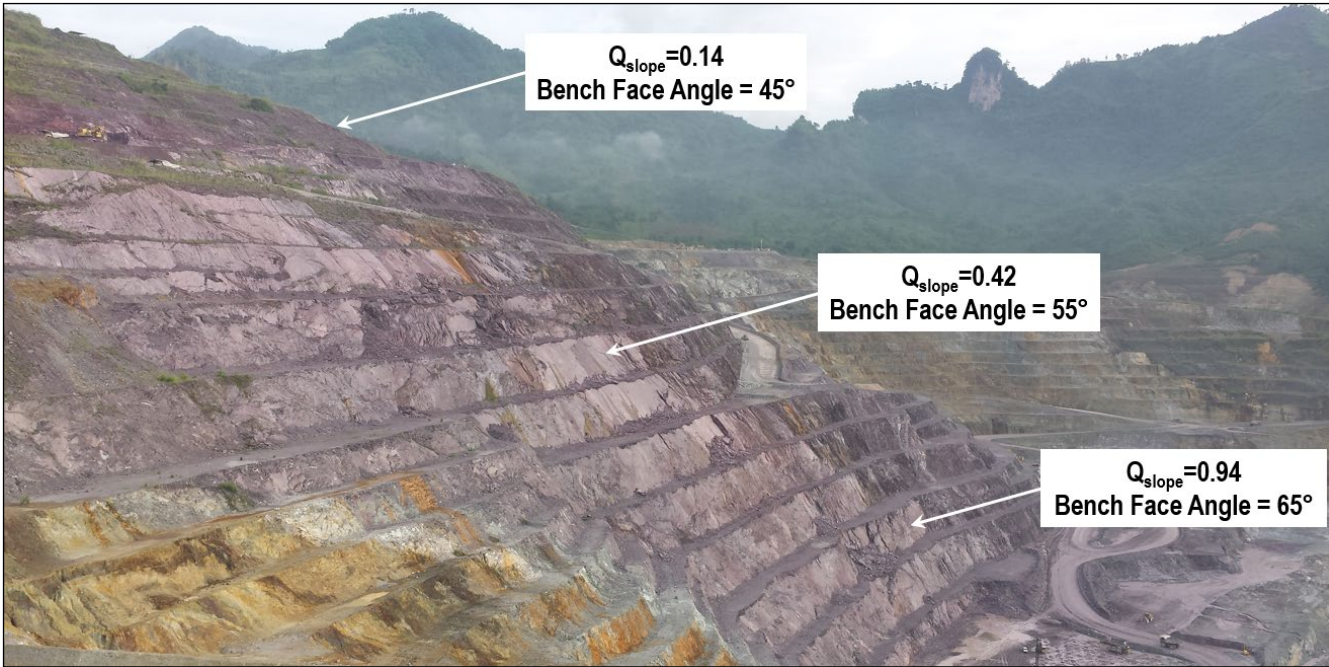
Changing geologic structure orientations (steepening of bedding planes downslope) help to explain the appropriately steepened bench face angles in a large open cast mine setting, Laos (Bar and Barton 2017). However, generally improved rock mass quality at depth may also influence this, as in Figure 1.
